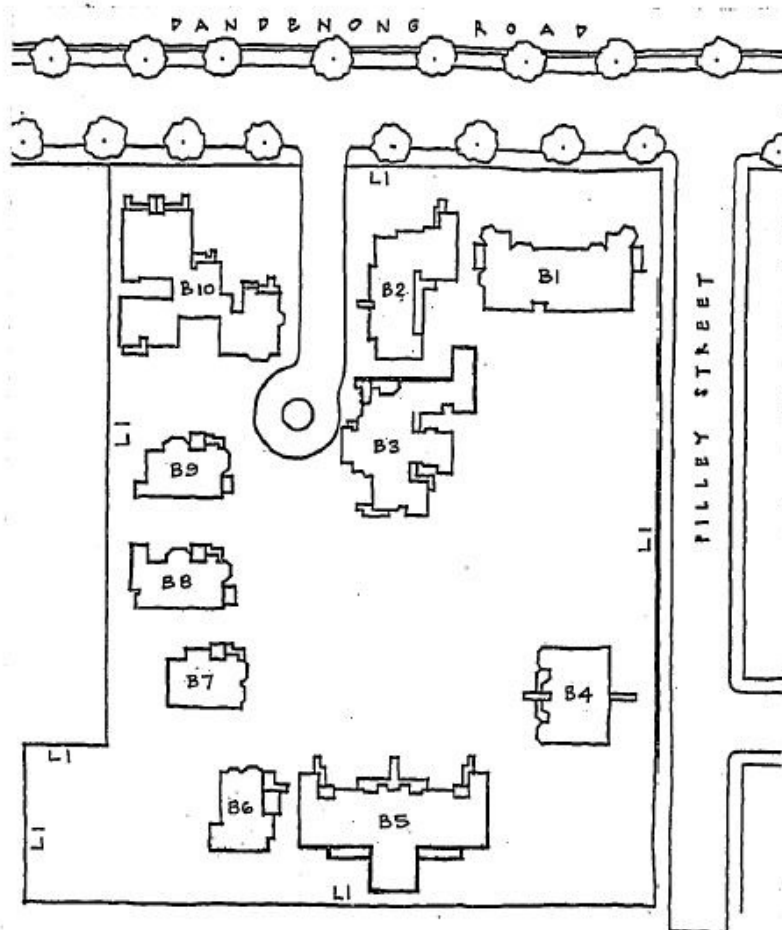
Heritage Victoria plan of 'Ardoch' showing significant buildings
